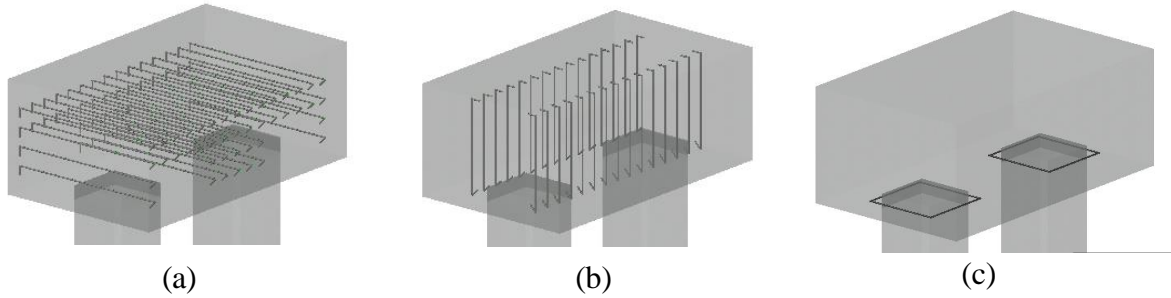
Interior pile cap reinforcement (a) horizontal, (b) vertical, and (c) embedded pile confinement reinforcement
